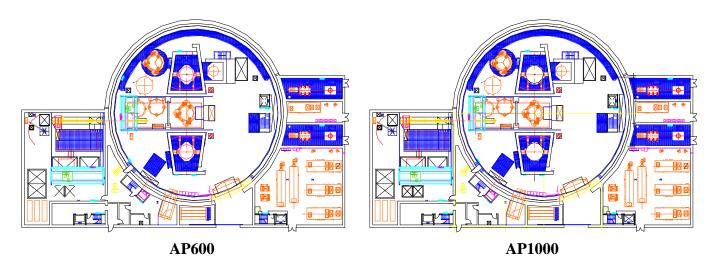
Westinghouse AP600 and AP1000 Plants (Plan)
